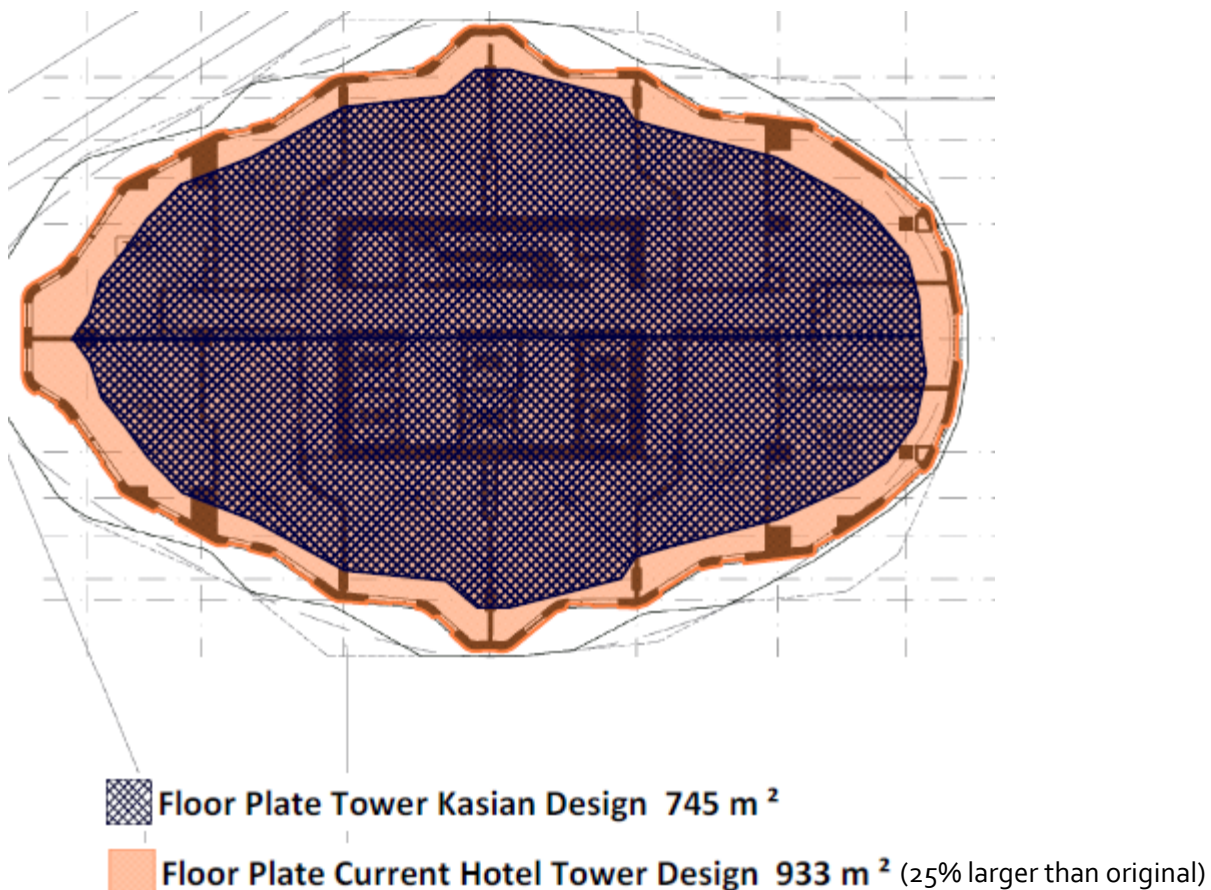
Comparison of Tower Floor Plates between Previous 2014 Development Permit & Current Proposal
